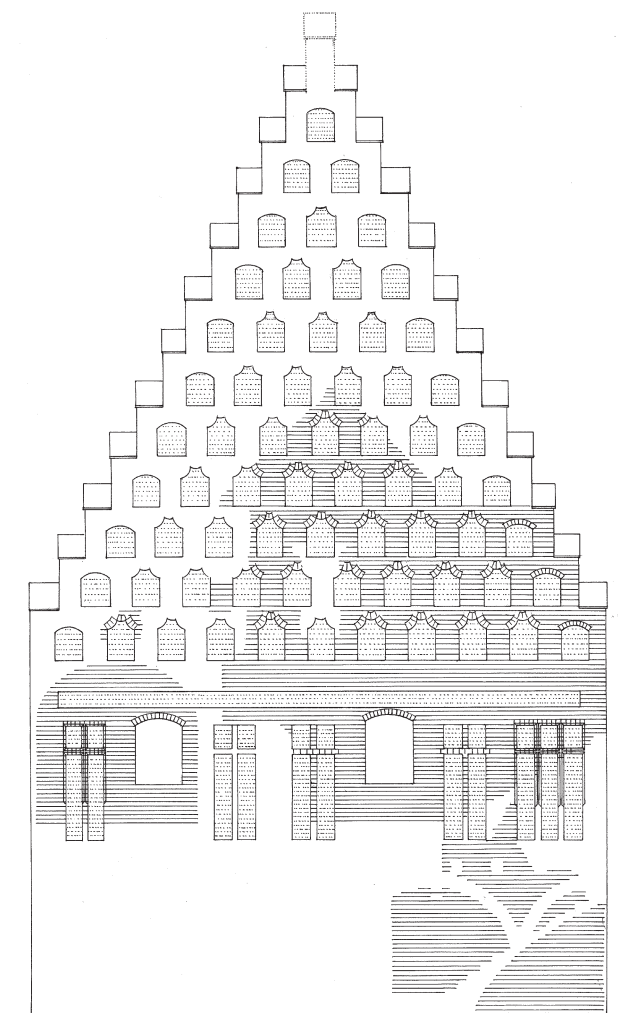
Reconstruction of the upper floor in the north elevation and gable of the Late-Gothic town hall (by A. Legendziewicz)
